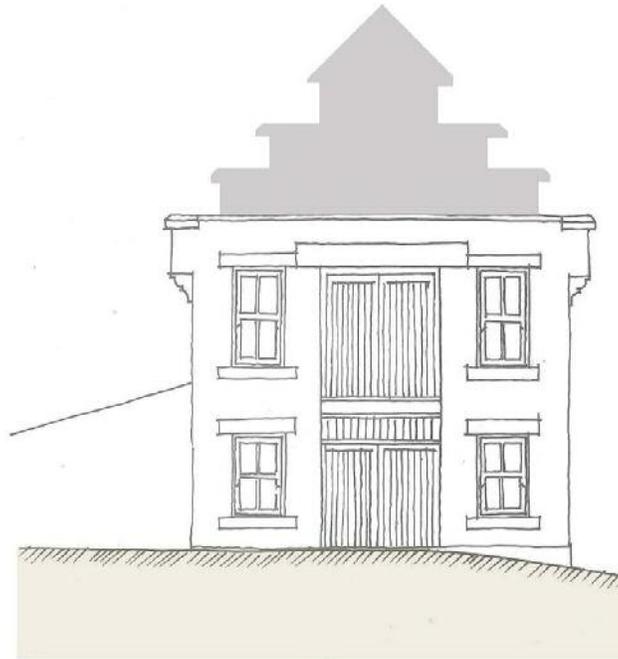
Sketch elevation of east (principal) facade. The earlier gable line/roof shown ghosted in grey is derived from documentary evidence shown at Figure 5. NBRSPartners (WDW), June 2008. Not to scale.
